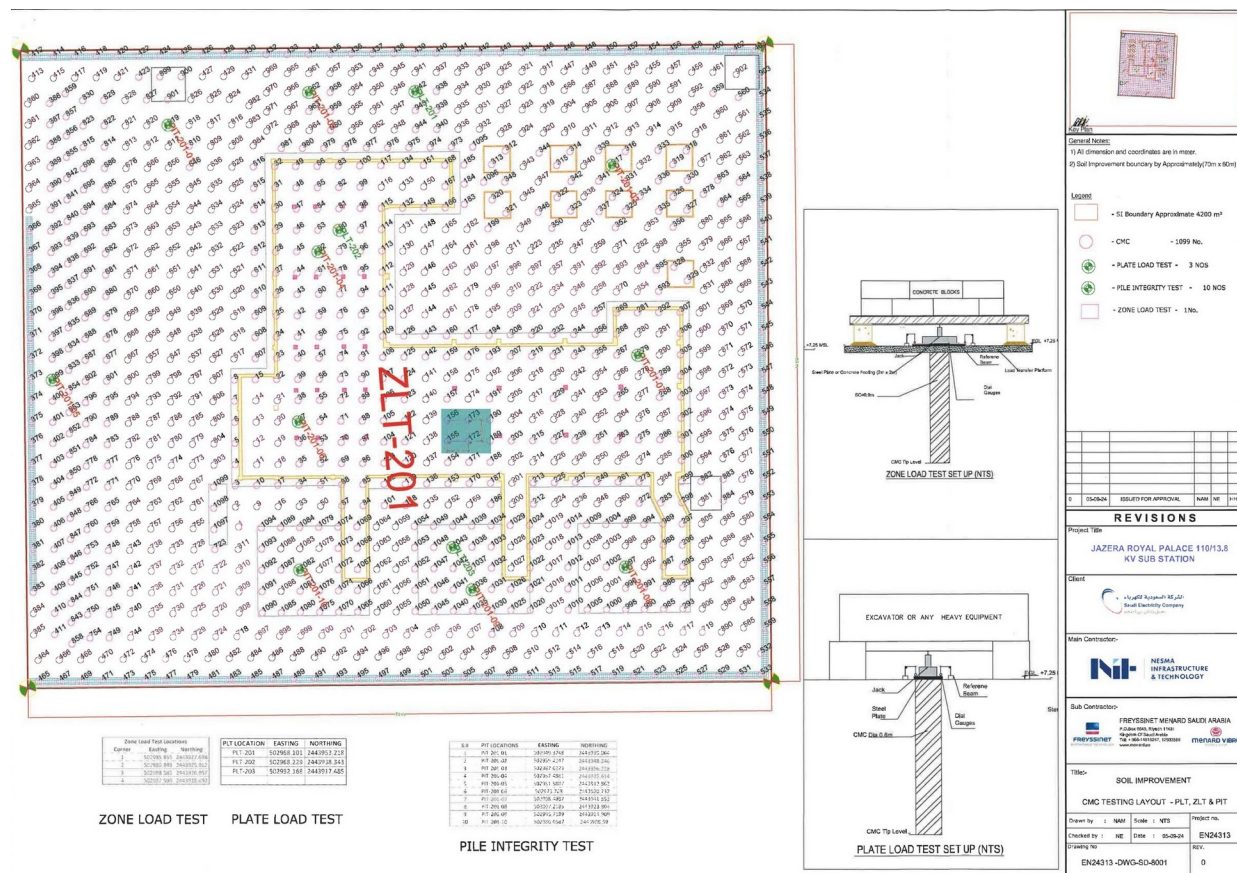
As-built CMC testing layout over the column grid: locations of the plate load tests (PLT-201 to 204), the zone load test (ZLT-201, over columns 155, 156, 172 and 173) and the pile-integrity tests, with the plate- and zone-load-test set-ups. (Menard FMSA-24047 report)
